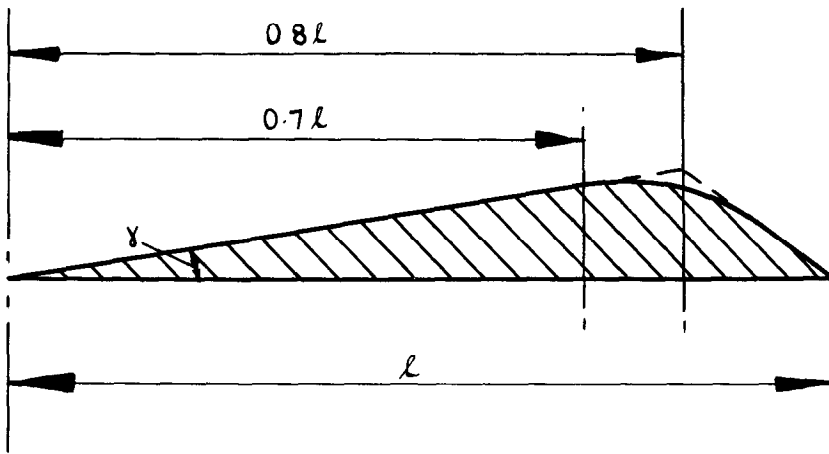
TYPICAL TRANSVERSE CROSS - SECTION
